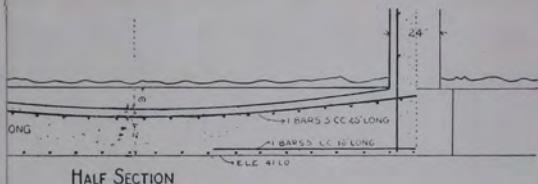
Shows a form of armoured concrete Roof, erected in India by Capt. Traill, R.E., which he says is easy to construct and very satisfactory. He writes:—
